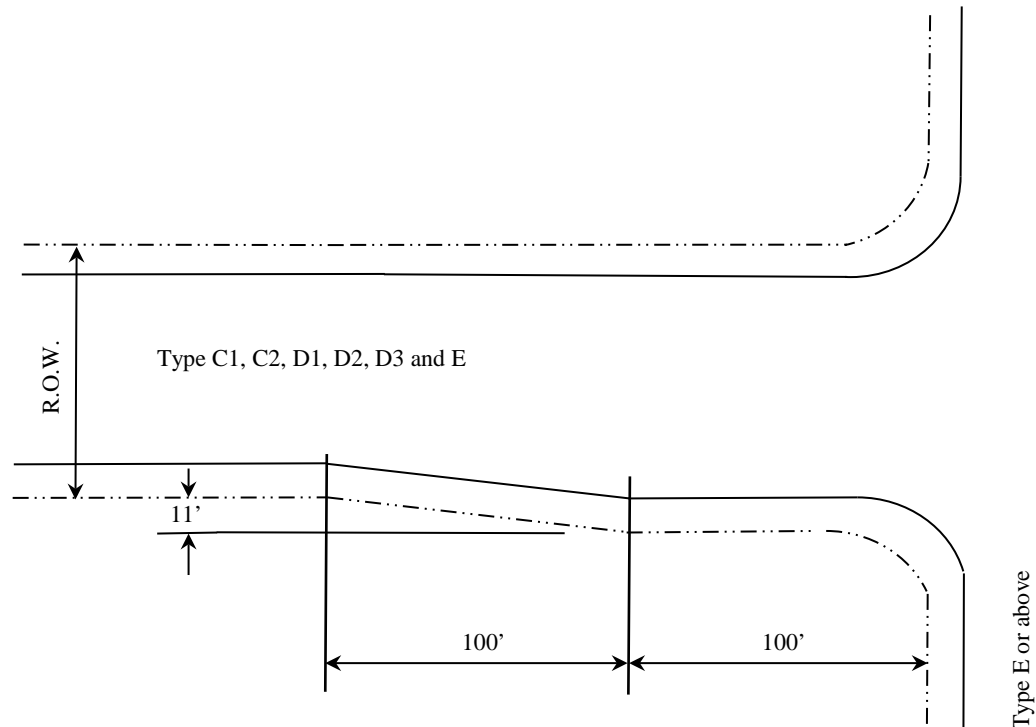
Type E and above Thoroughfare Intersection Detail
